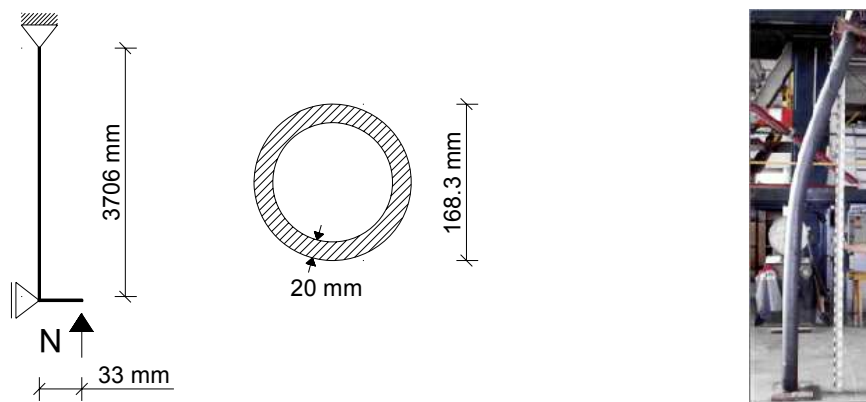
Static system and cross-section of the columns tested in 2005 and 2006 (left); column tested in 2006 after fire test (right).
